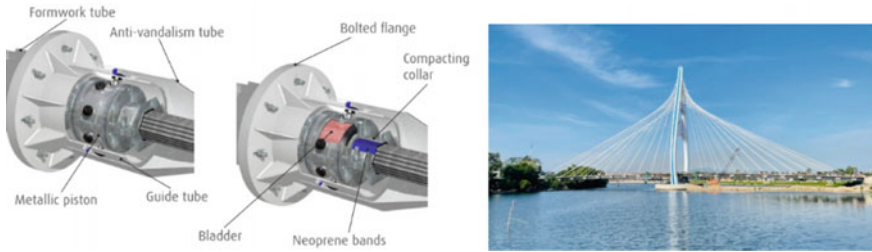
Internal hydraulic damper applied for Sông Hiếu bridge and Sông Hiếu bridge during construction
